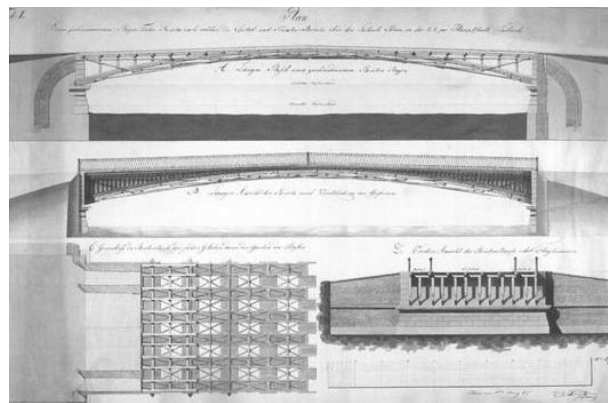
Franz Hutter's 1837 plan of an iron arch bridge [ZAL, 1837].
